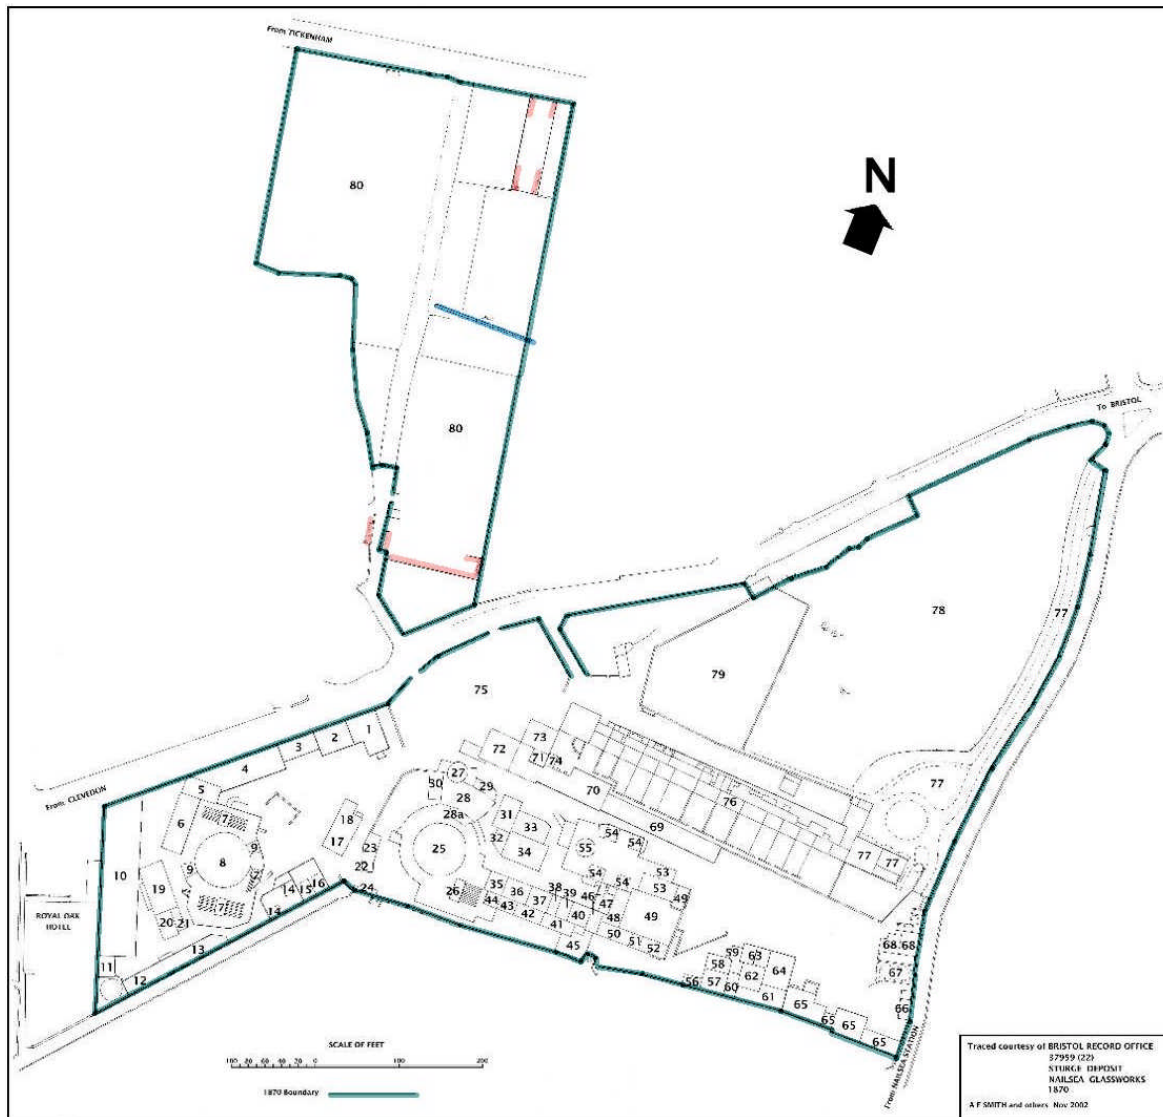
1870 Plan of the Nailsea Glassworks Holding [BRO Sturge Deposit 57959 (22)]
